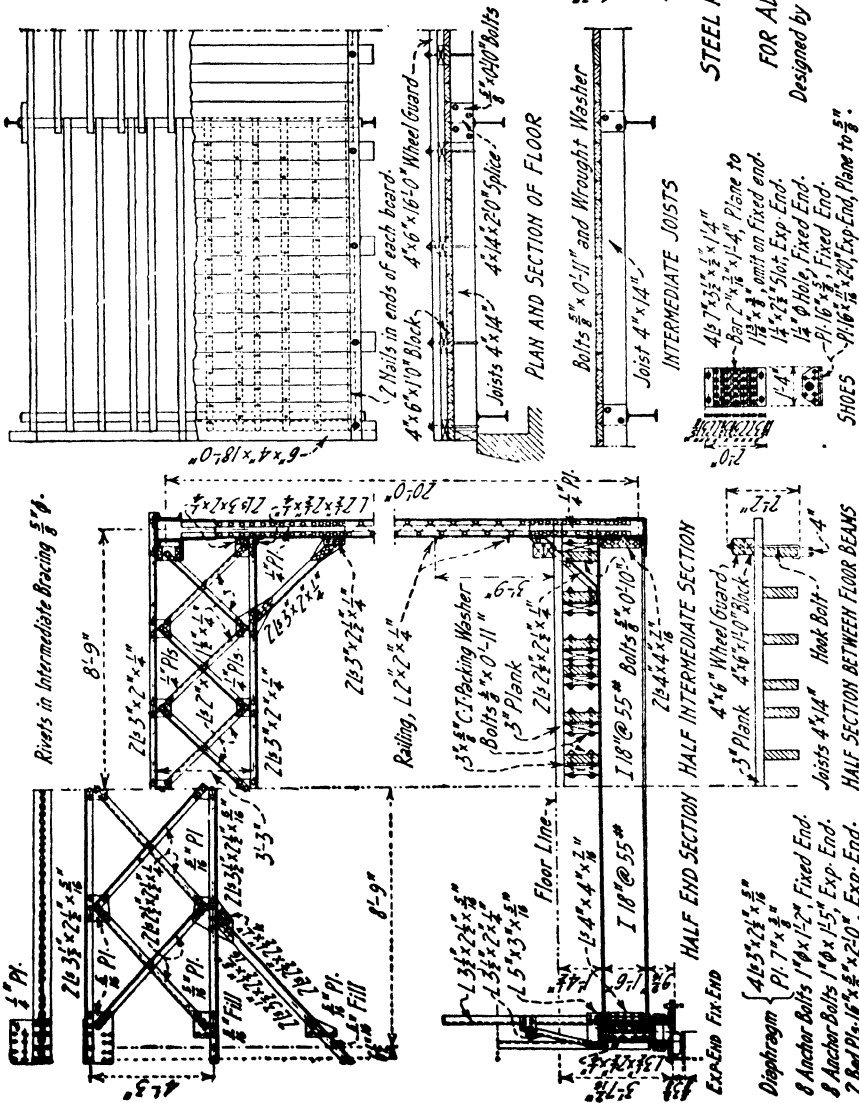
DETAILS OF A THROUGH RIVETED HIGHWAY BRIDGE.
